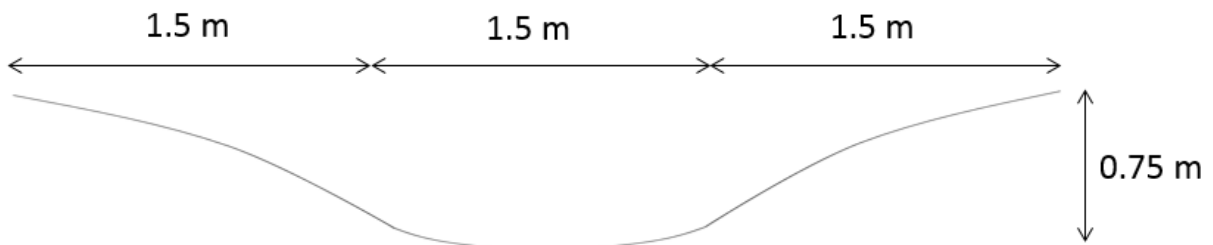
Long Section of a Tiered Scrape System (NTS)
